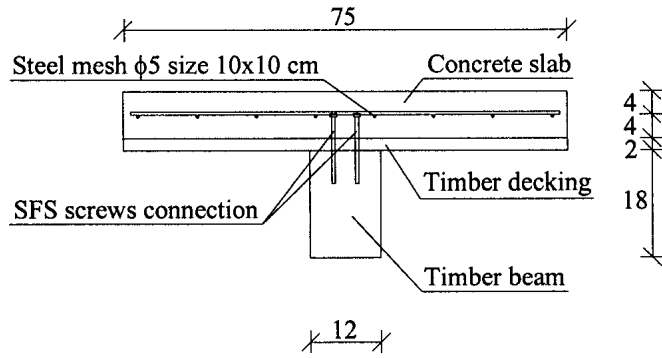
Cross-section of the TCC tested at the EMPA laboratory, Dubendorf
